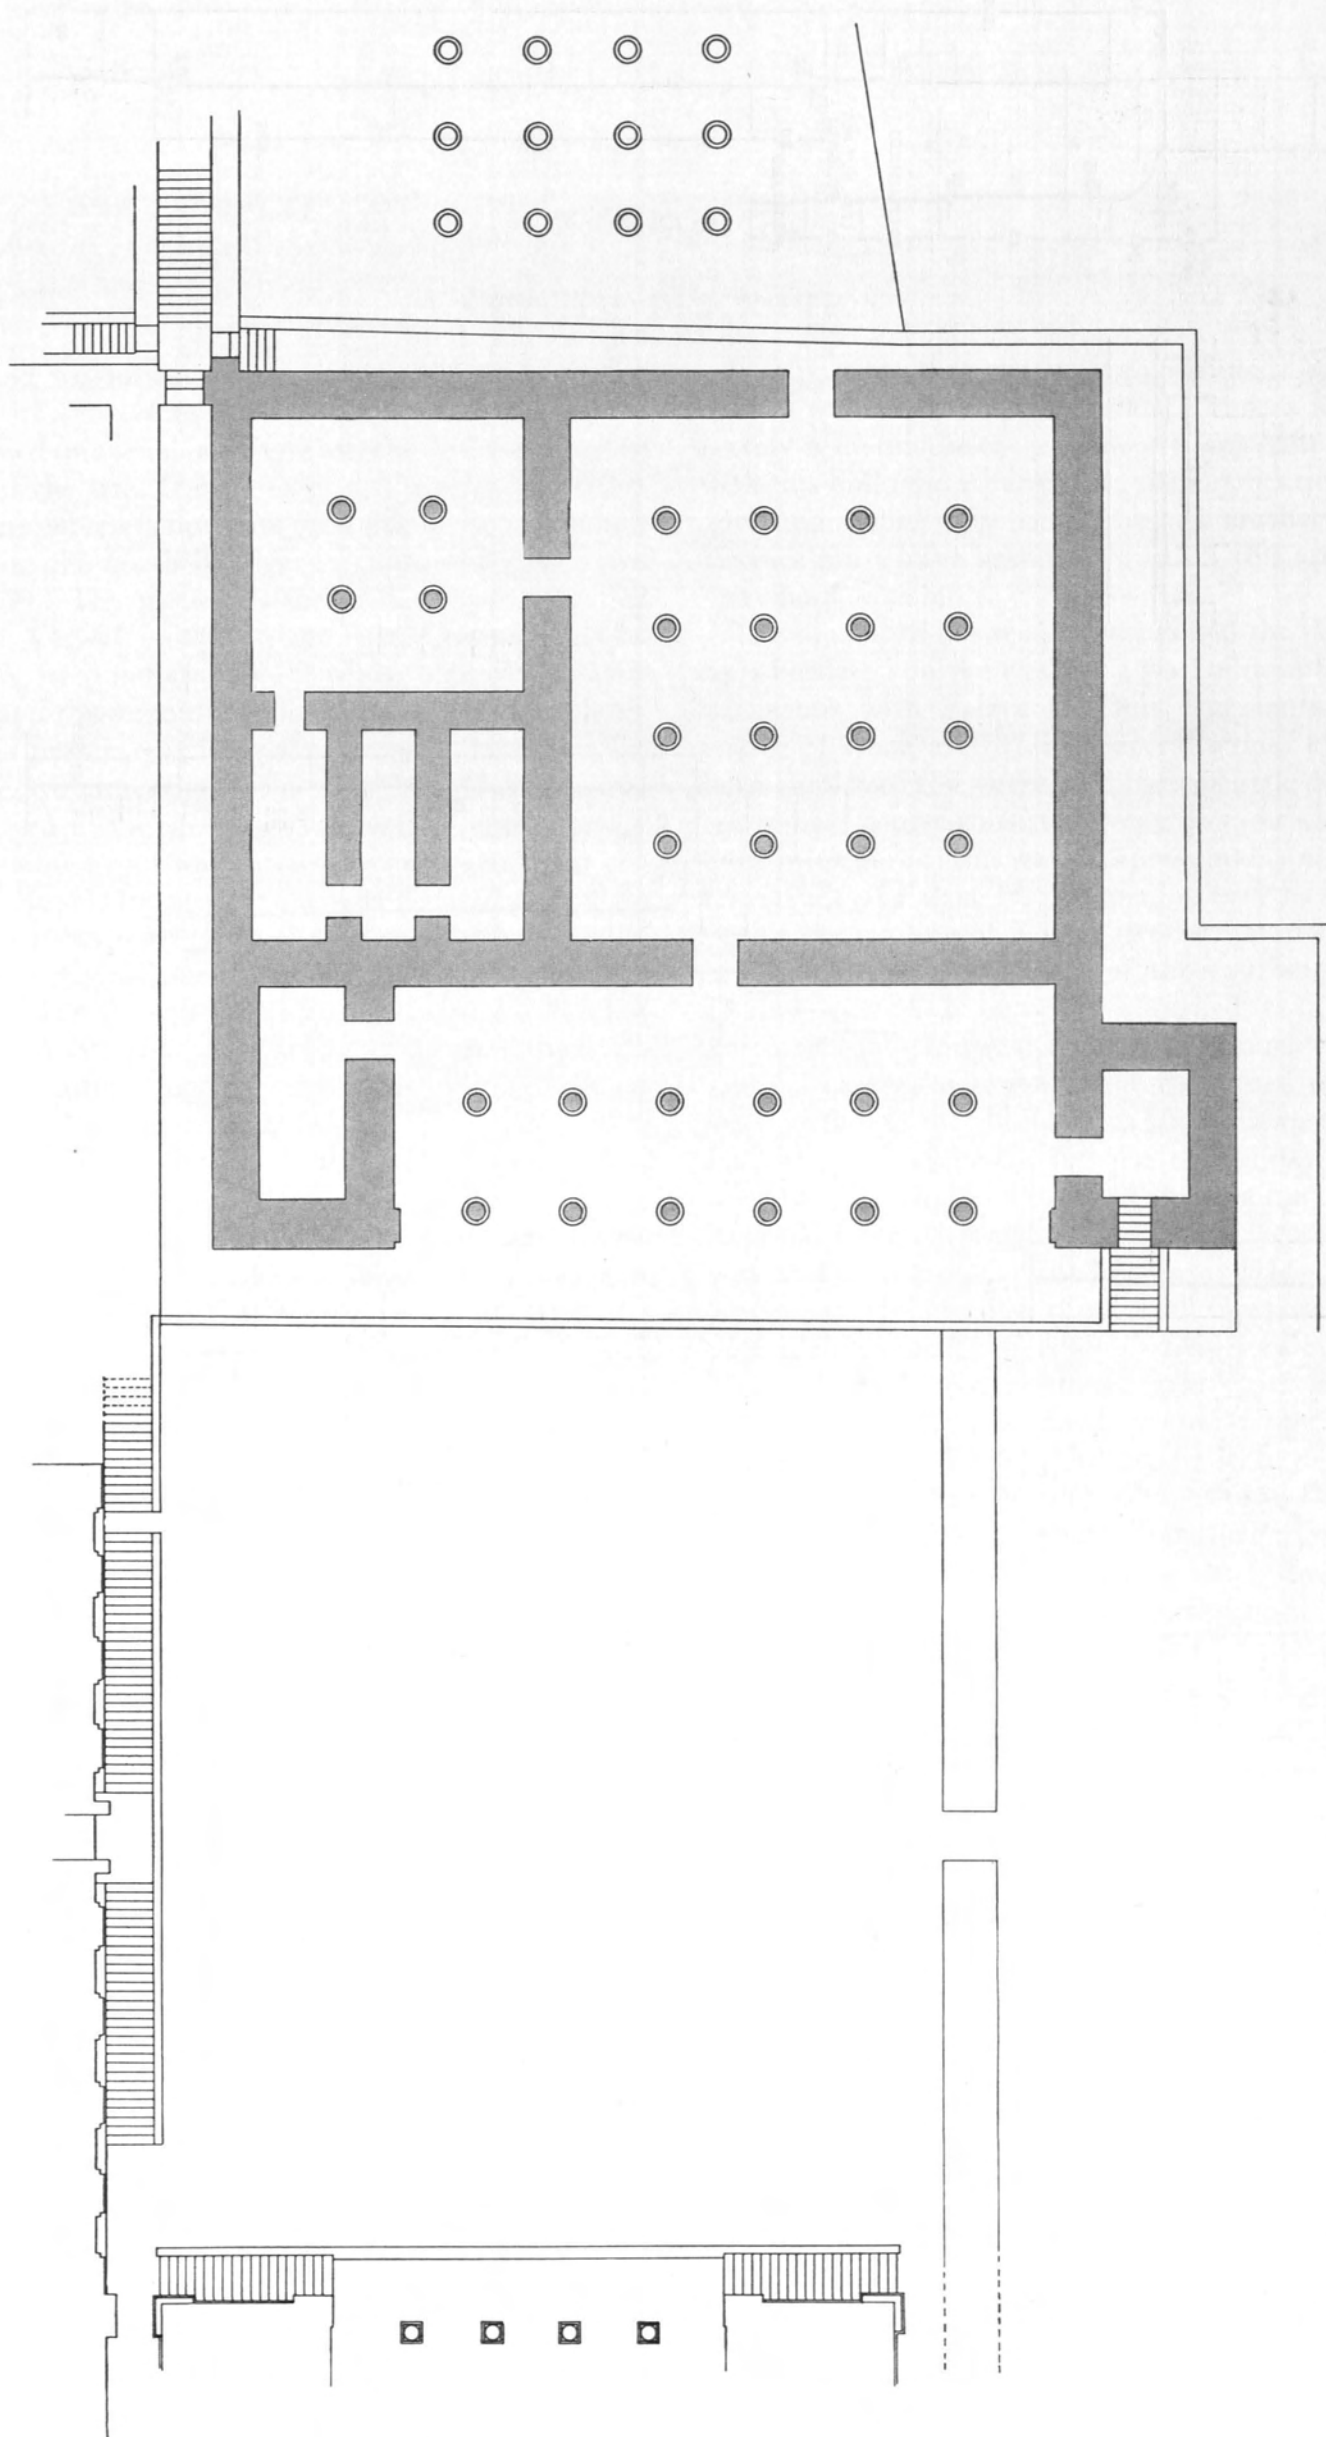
TENTATIVE RECONSTRUCTION OF PLAN OF PALACE H. SCALE, 1:300
